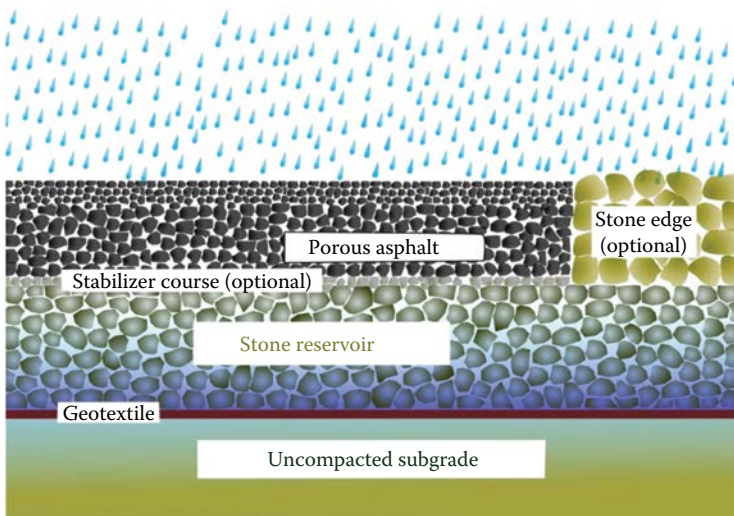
Potential porous asphalt pavement structure with a stone reservoir and geotextile layer. (Credit: National Asphalt Pavement Association.)
